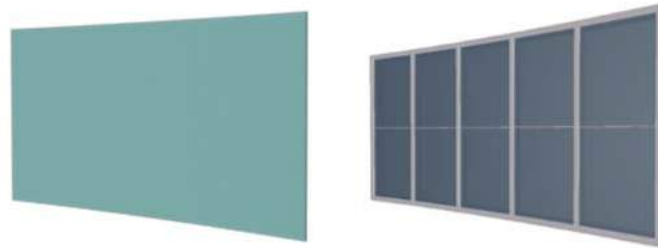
Glass Wall surface in CAD (on the left) and Curtain Wall object in BIM (on the right)
